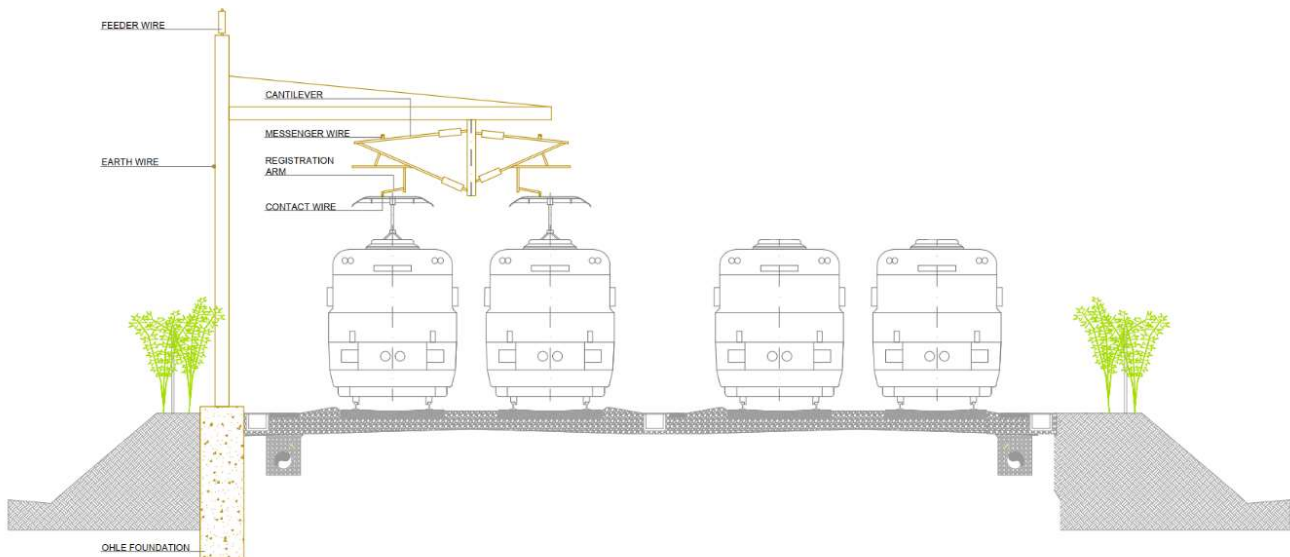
Typical OHLE arrangement in 4- four track open route
